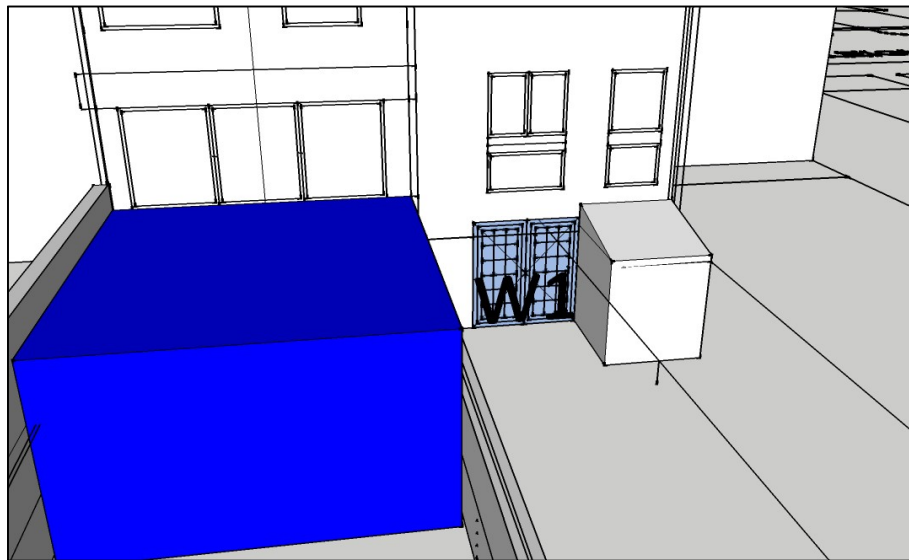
Window W1, Ground floor, 40 Leighton Road (3D Model with window ID's)
